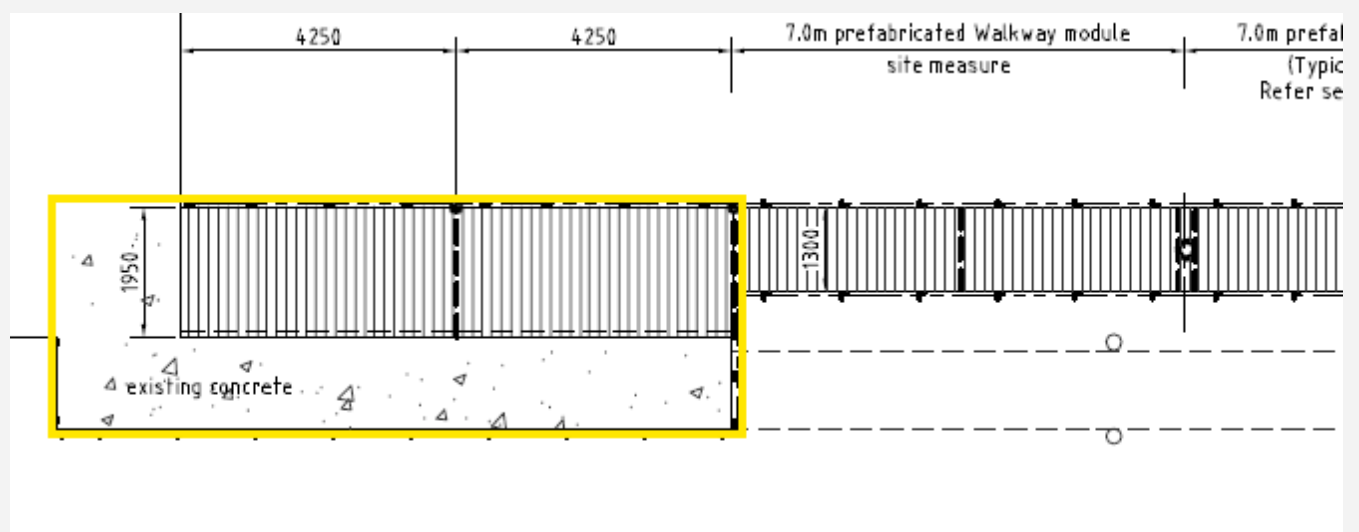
plan showing location proposed of rooved section to provide Te Ana-au Glowworm Caves visitors with more shelter while waiting to embark the Luminosa.
